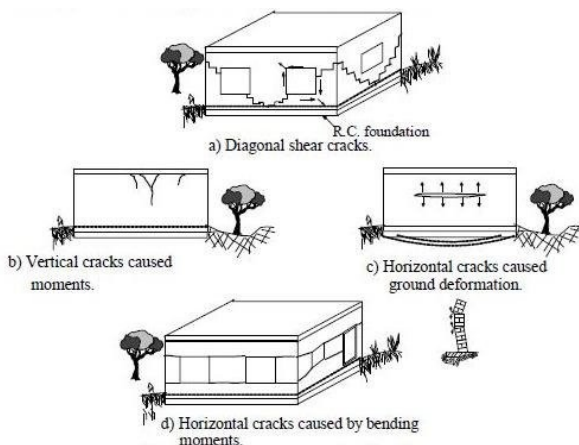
Typical cracks indicating swelling soils (Hamza, 2016)
